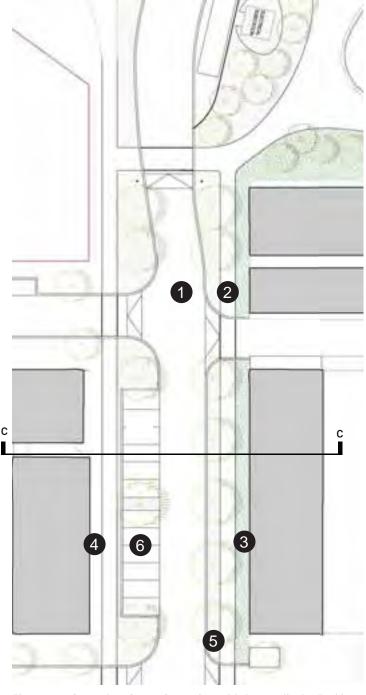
Secondary Street Scenario 1 with Perpendicular Parking Illustrative Plan
